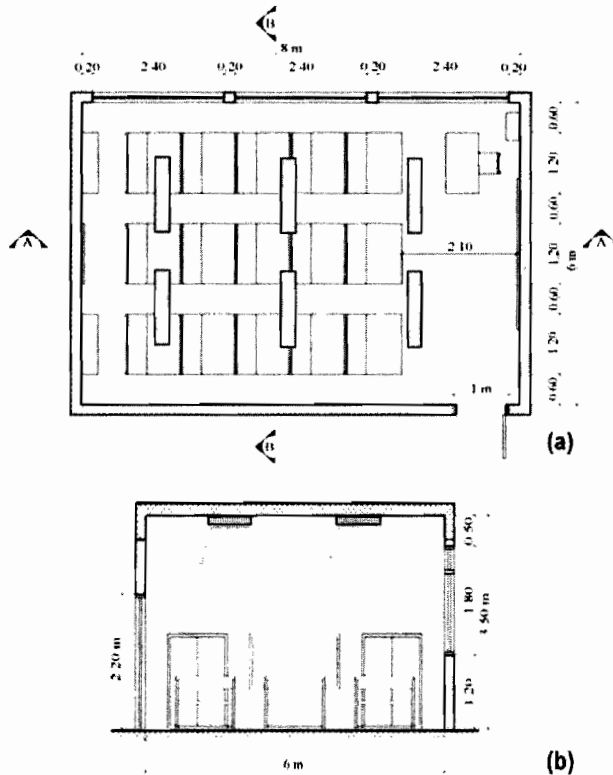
Plan (a) and section (b) of the artificial lighting system of a typical classroom in Libya (source: Drawing made by author).
